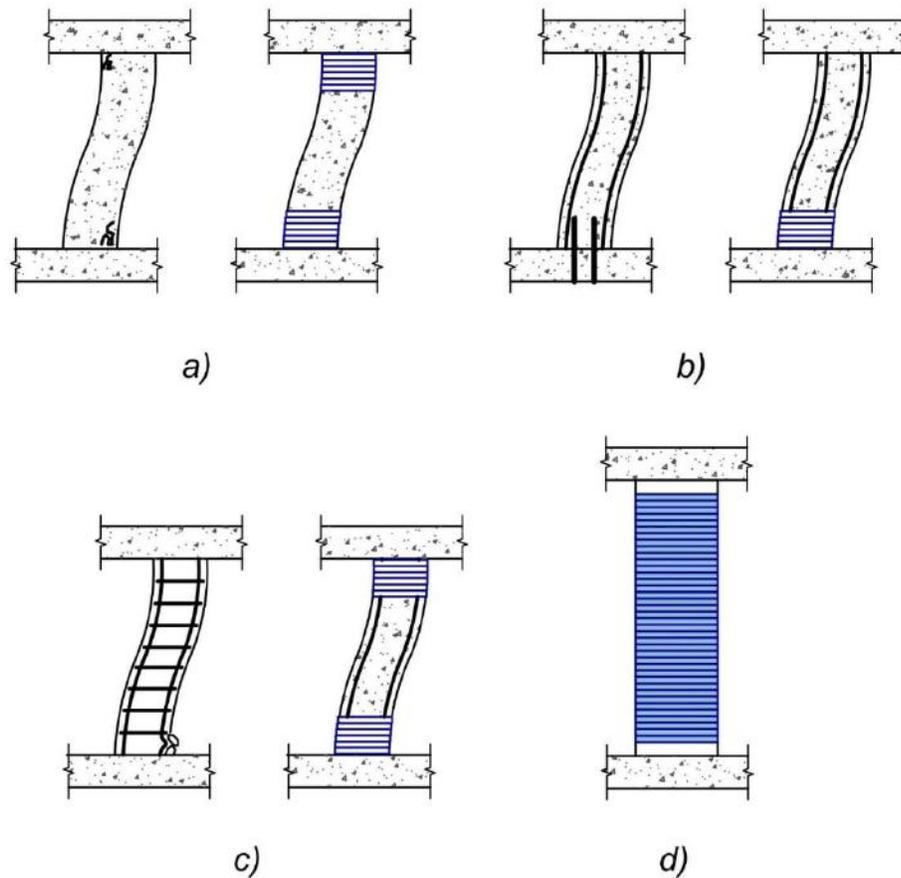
Retrofitting of RC columns using FRP overlays: a) confinement to increase lateral deformation capacity; b) confinement to prevent lap splice failure; c) confinement to prevent reinforcement buckling, and d) wrapping to increase shear capacity (Triantafillou, 2006).
